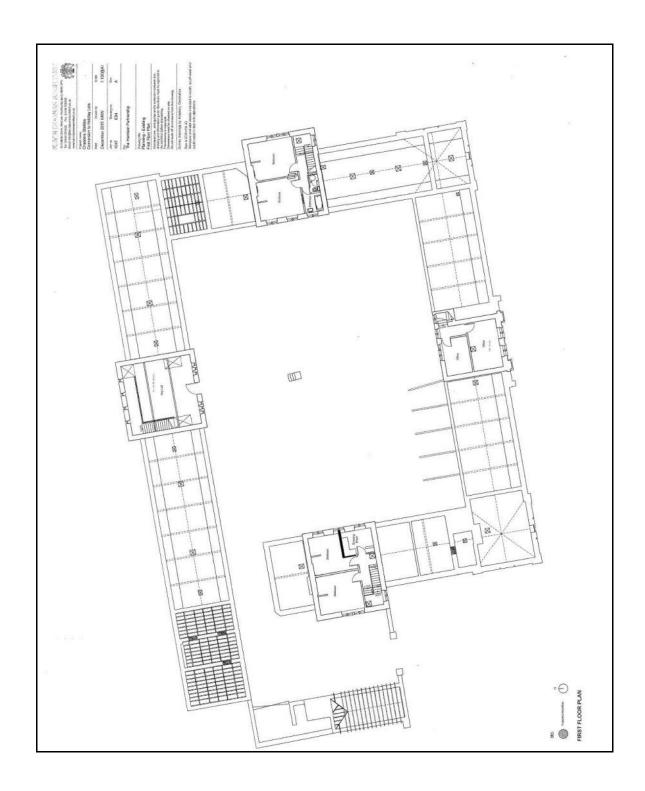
Chesters Stables. First-floor plan (Doonan Architects Drawing E04).
